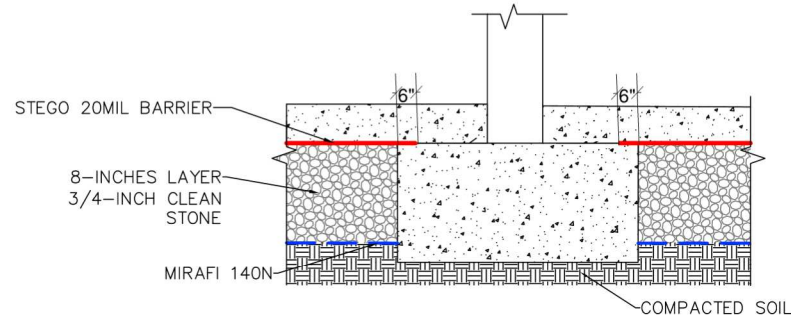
TYPICAL SECTION THROUGH SUB-SLAB
